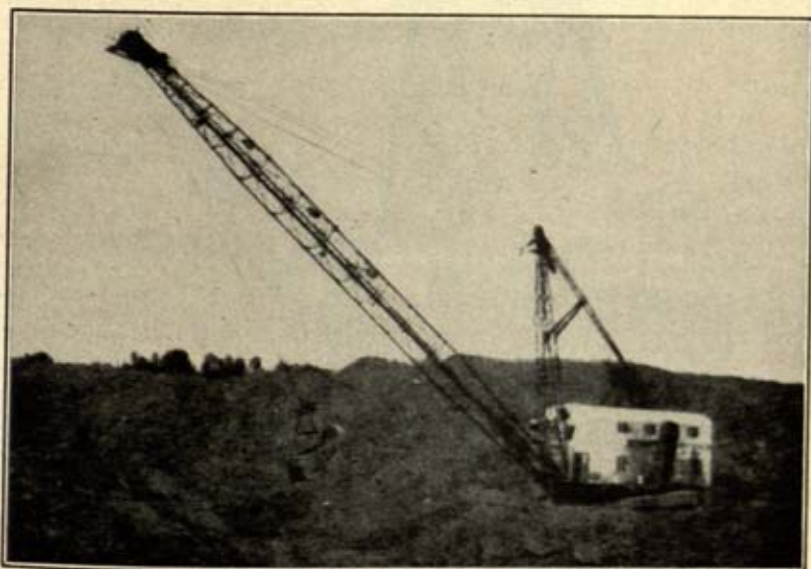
Walking dragline with 135-ft boom and 6-cu-yd bucket. (*Page Engineering Co.*)
